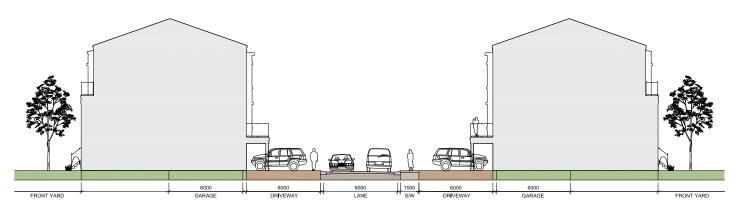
Conceptual section of typical townhouse and lane interface.
